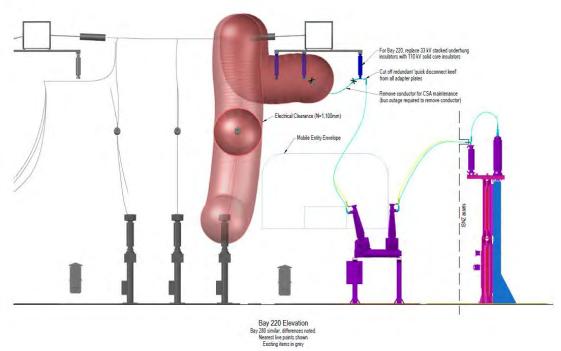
Elevation of Proposed Transpower Works Planned for 2026
